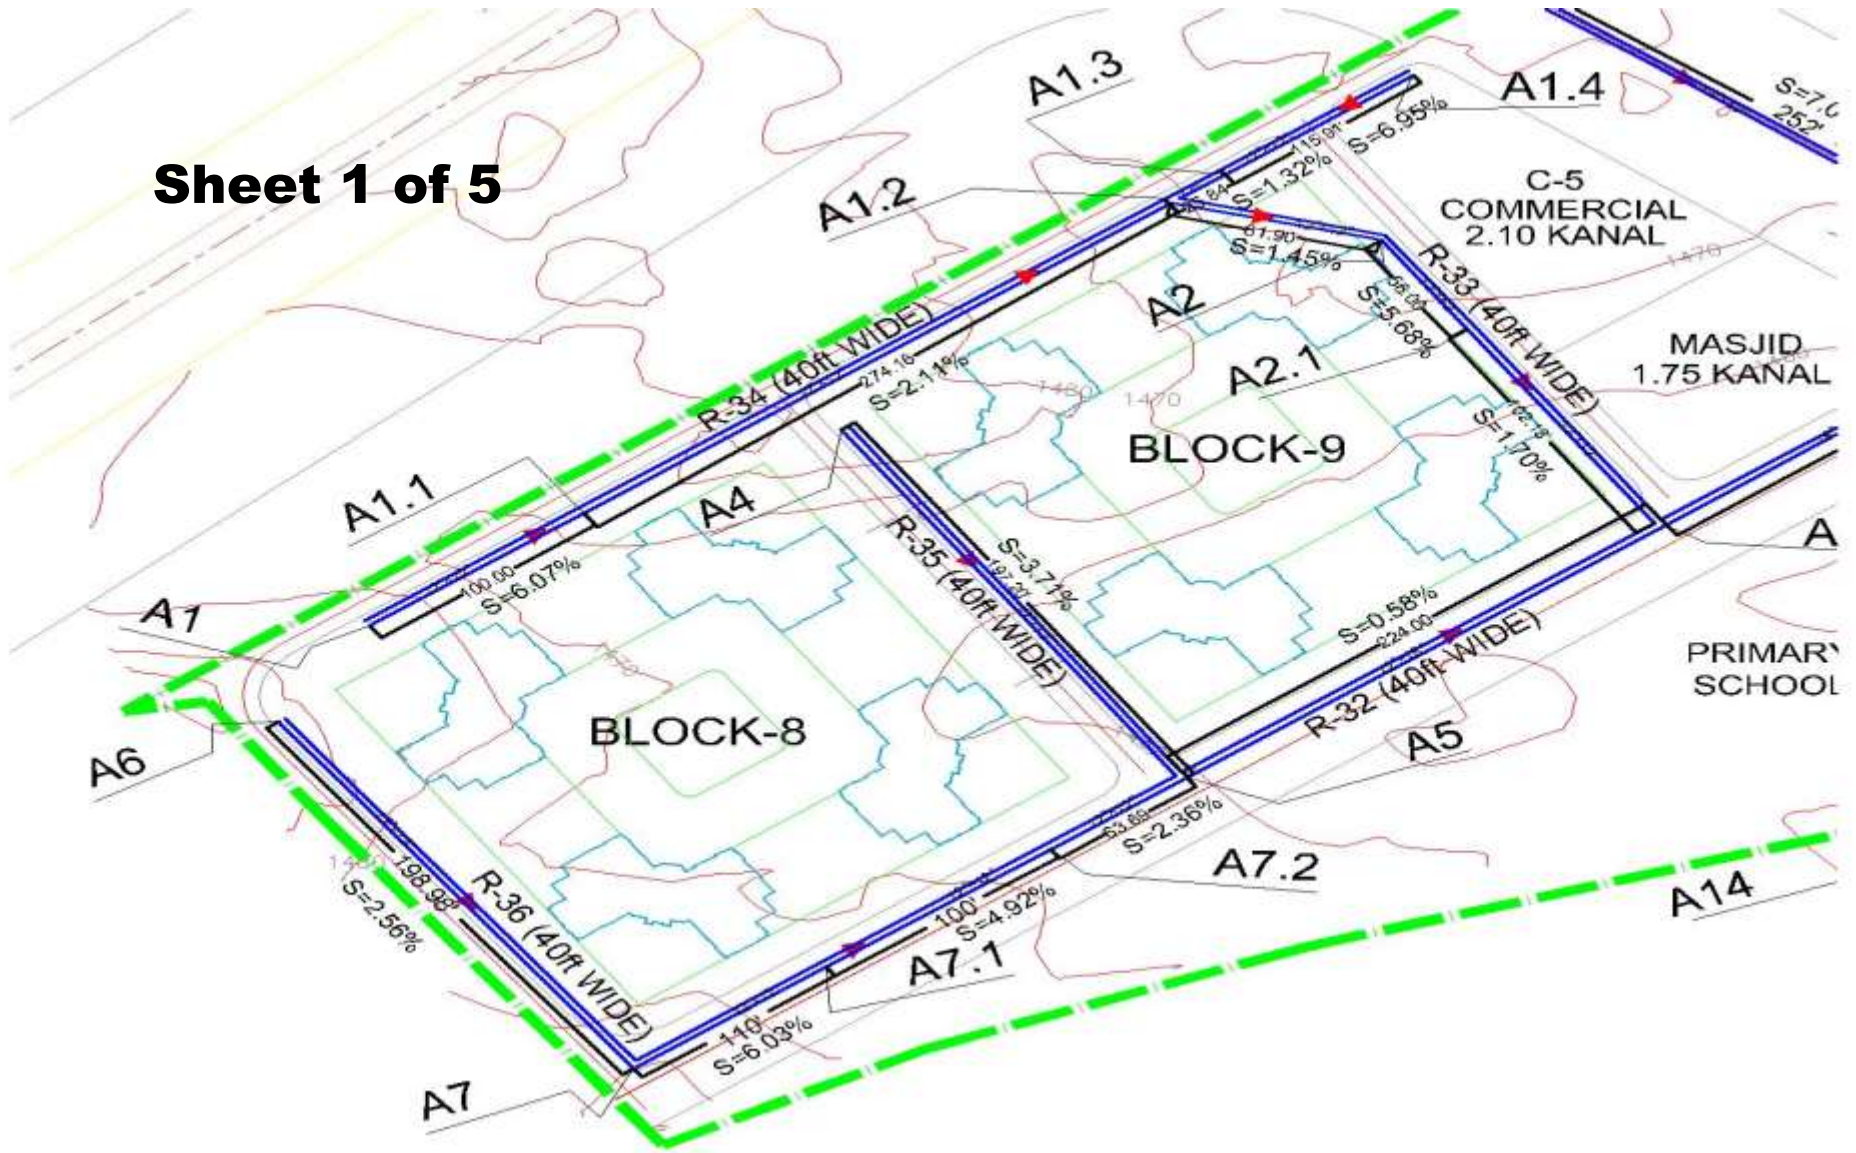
Storm drainage layout plan of Sub-catchment-9 part one at R/S of MR-01
